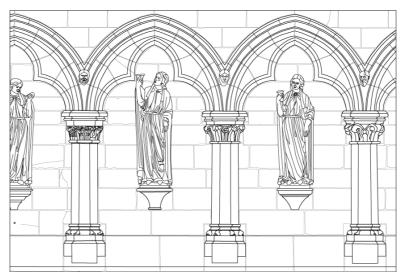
Excerpt from west façade of Bremen Cathedral, original scale 1:20
